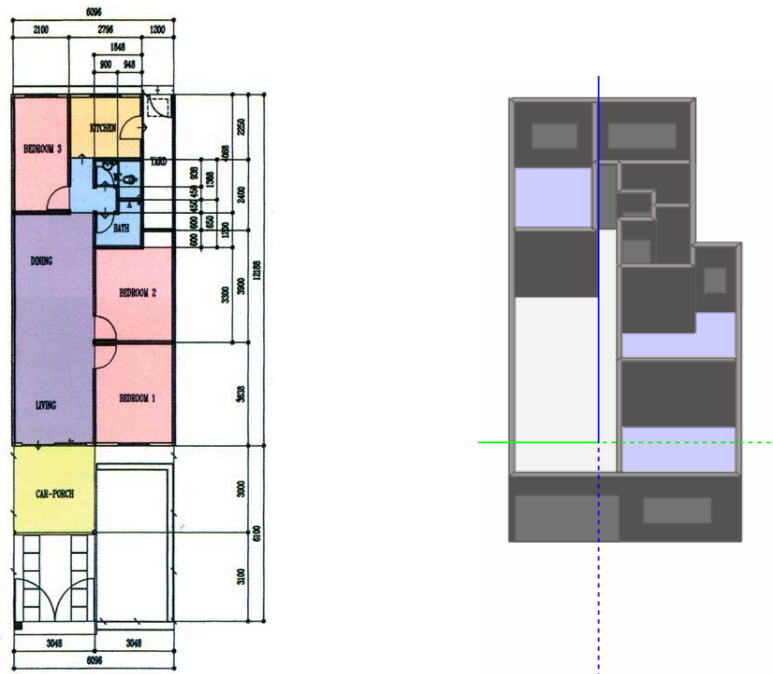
Floor Plan for Terrace House (left) and the same House transferred to DesignBuilder (right).
